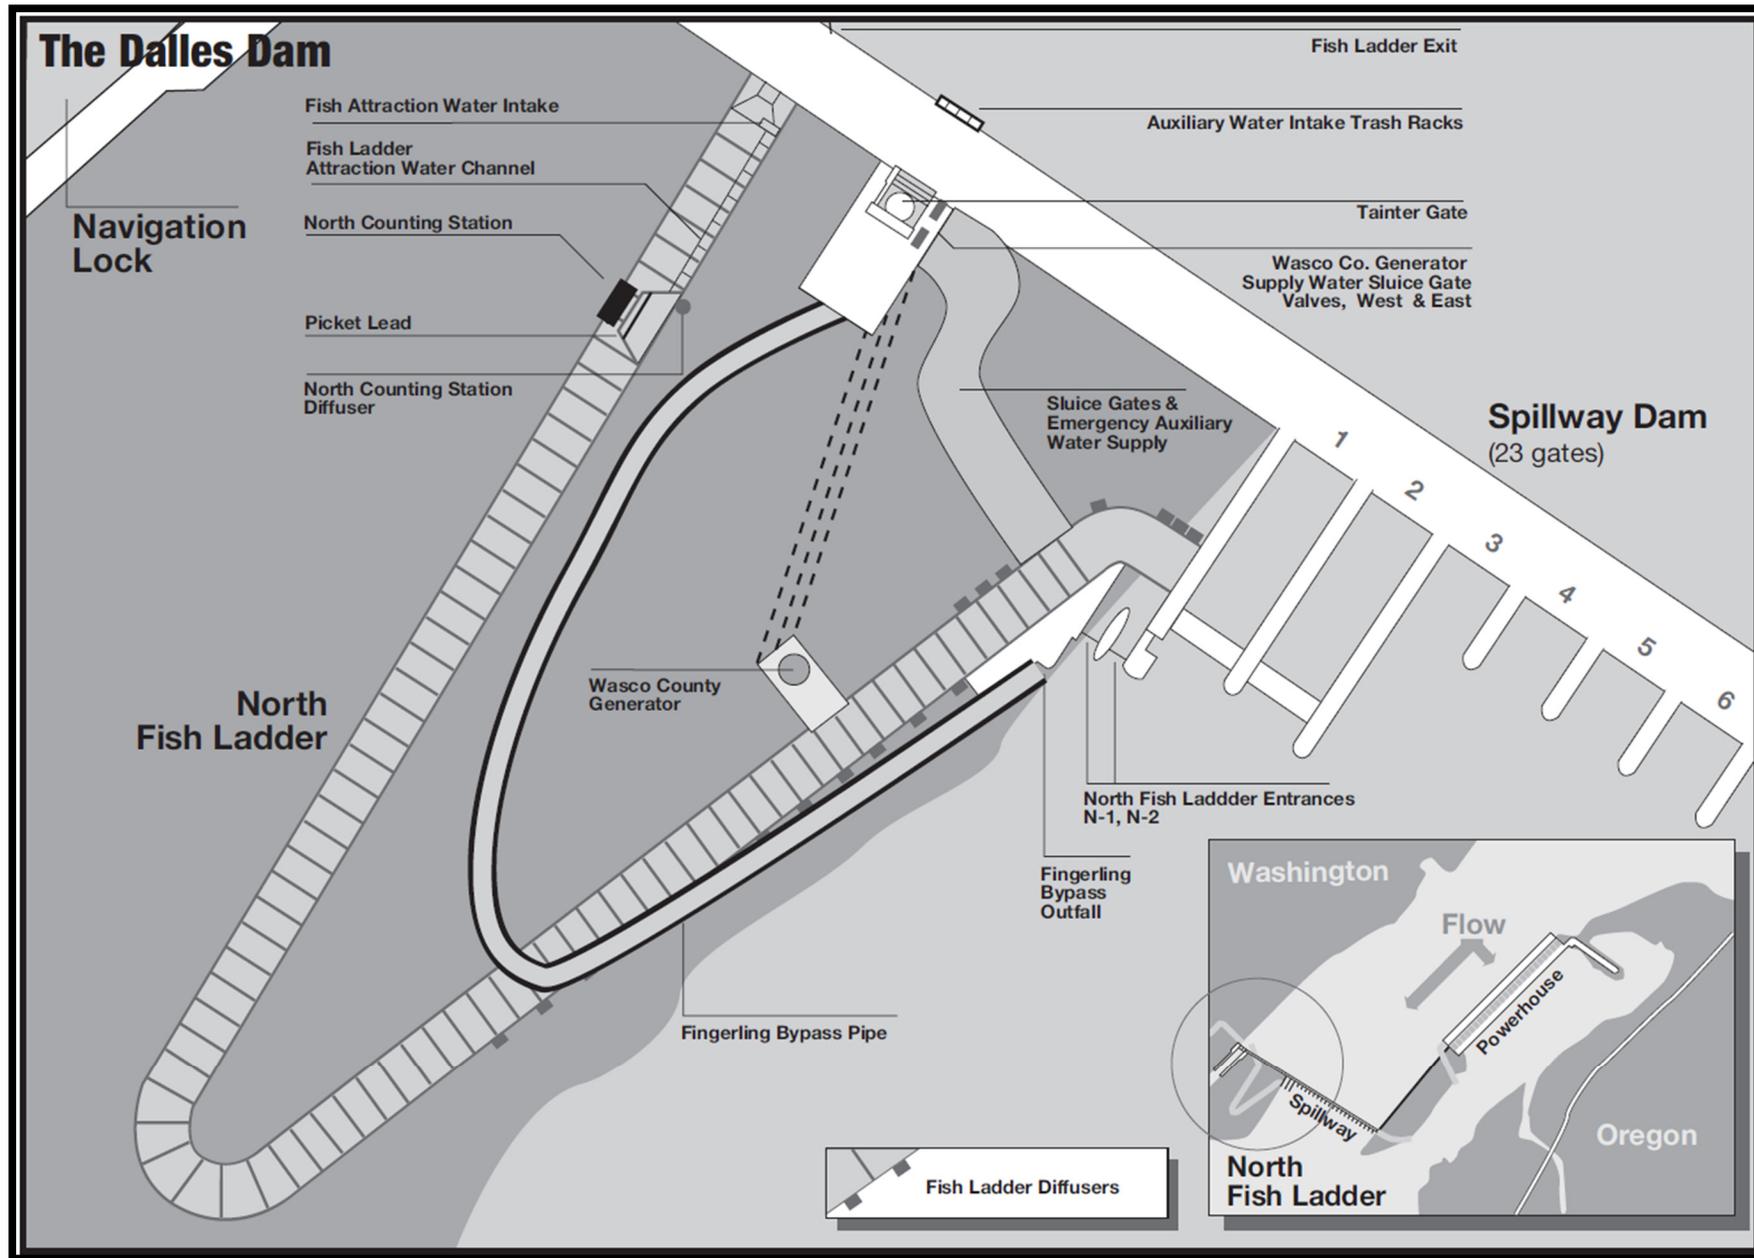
The Dalles Dam North Fish Ladder and Spillway.
